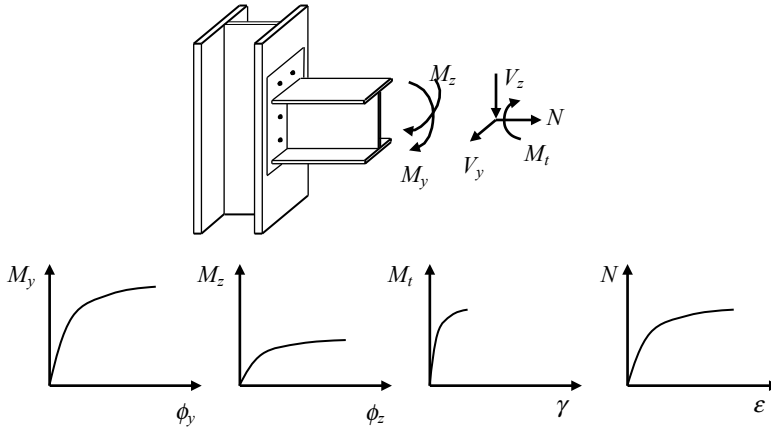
Typical 3D behaviour of bolted end-plate beam-to-column steel joint
